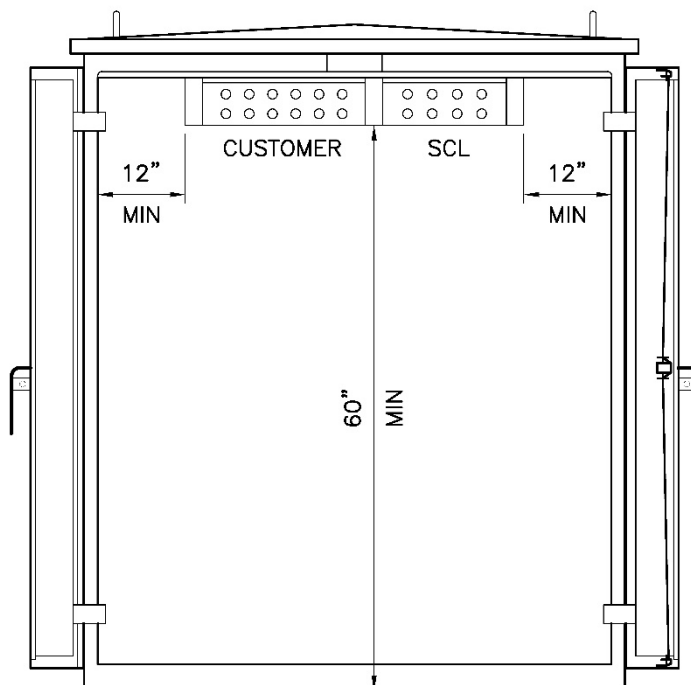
Enclosure with Bus Bars Perpendicular to the Openings, Front View
